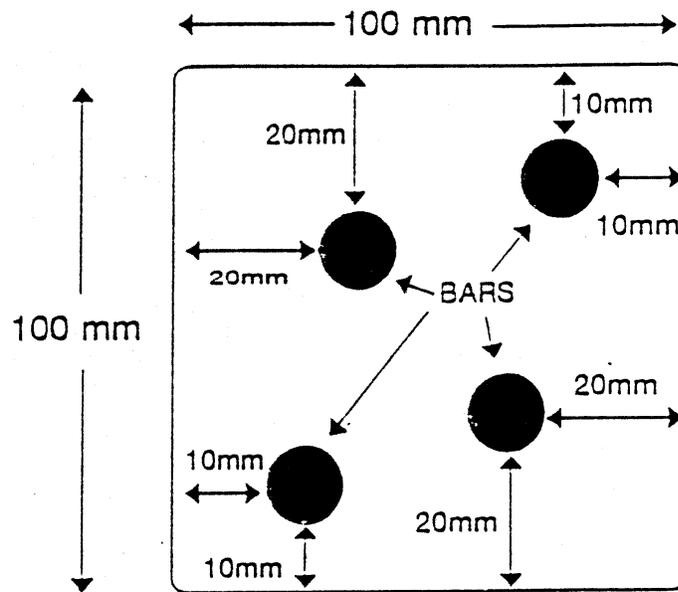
Cross-Section of Beam Specimens¹⁸
